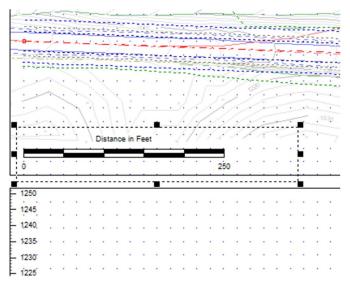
Scale Bar in Lower Left Corner of Plan Sub-View
